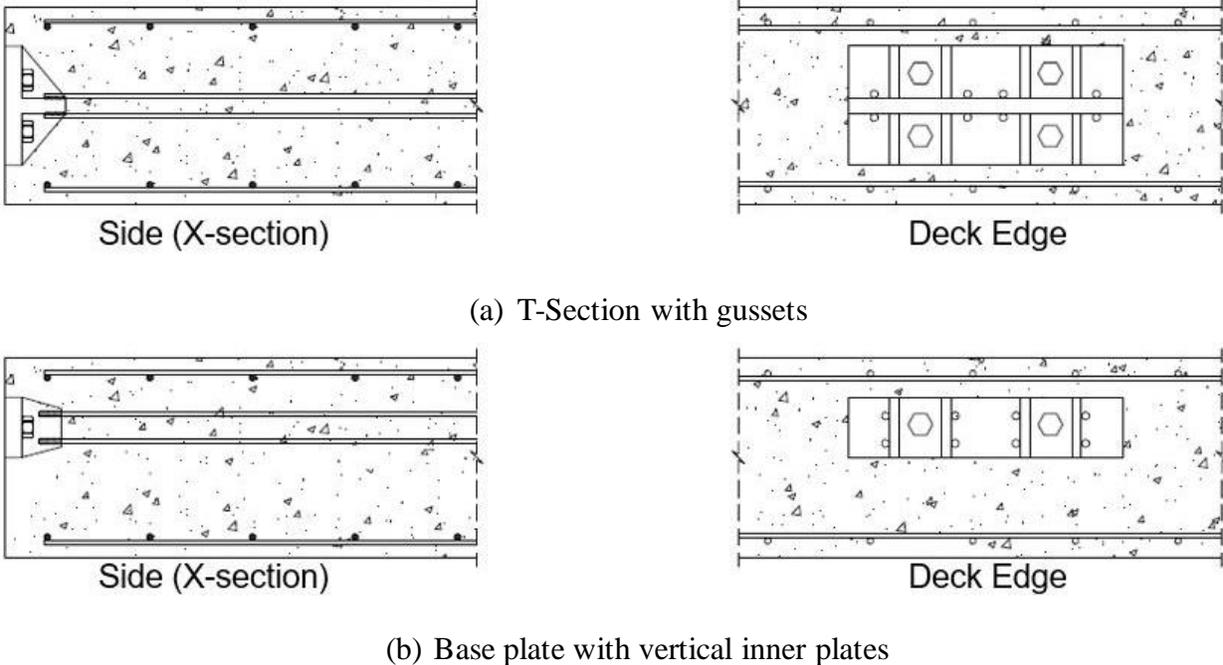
(a) T-Section Built-up Shape, or (b) Structural Base Plate Anchorage Devices
